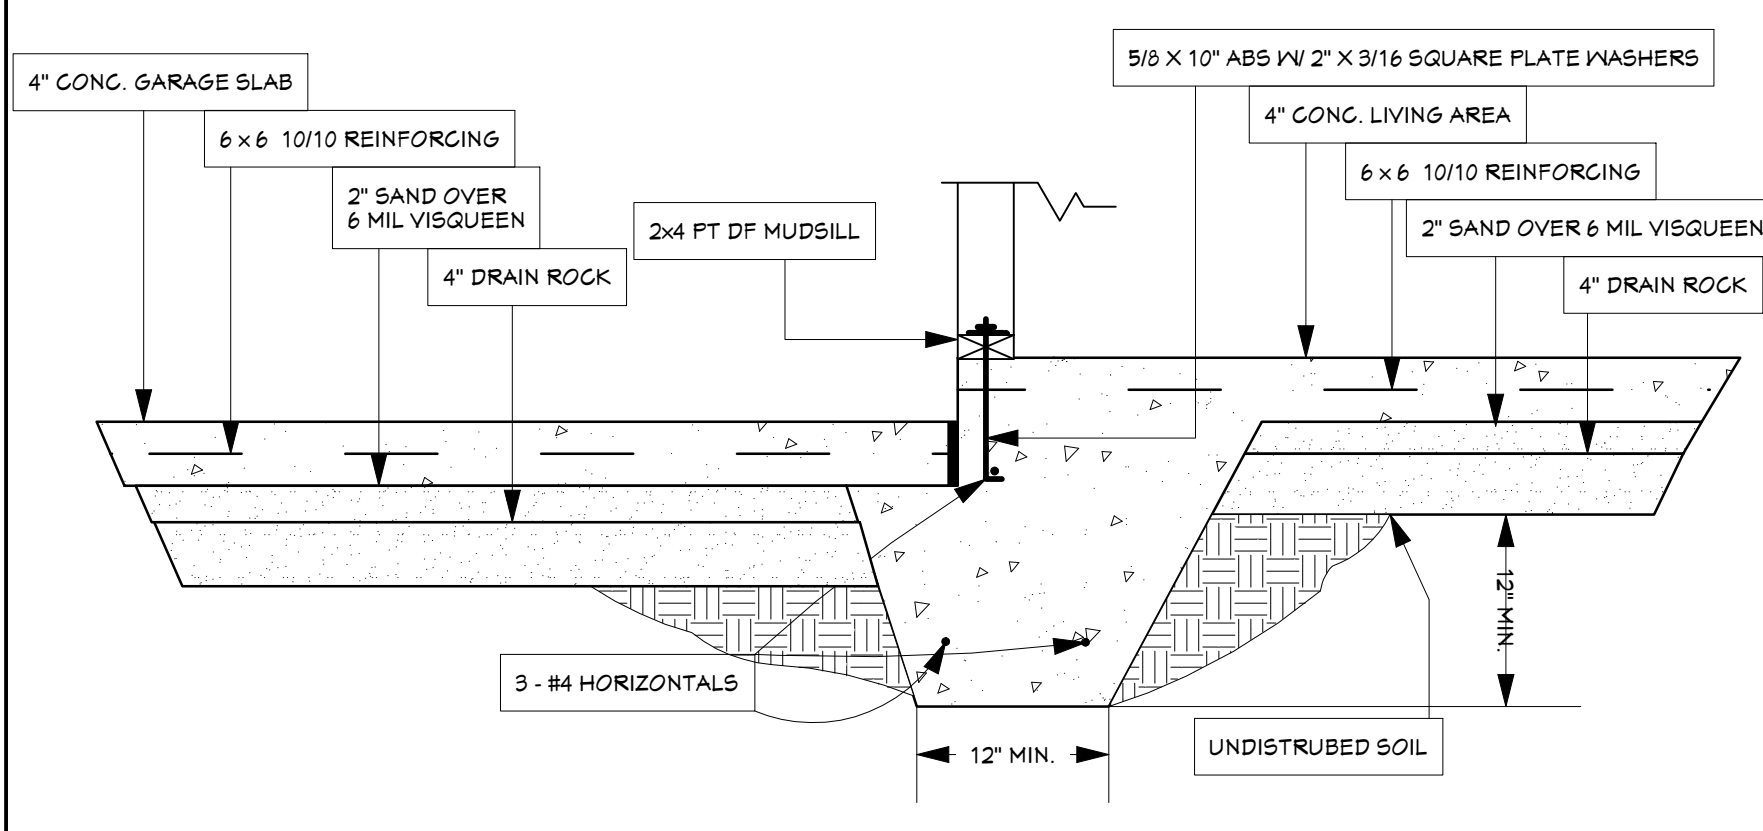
APPROACH EDGE OF GARAGE FLOOR SLAB
